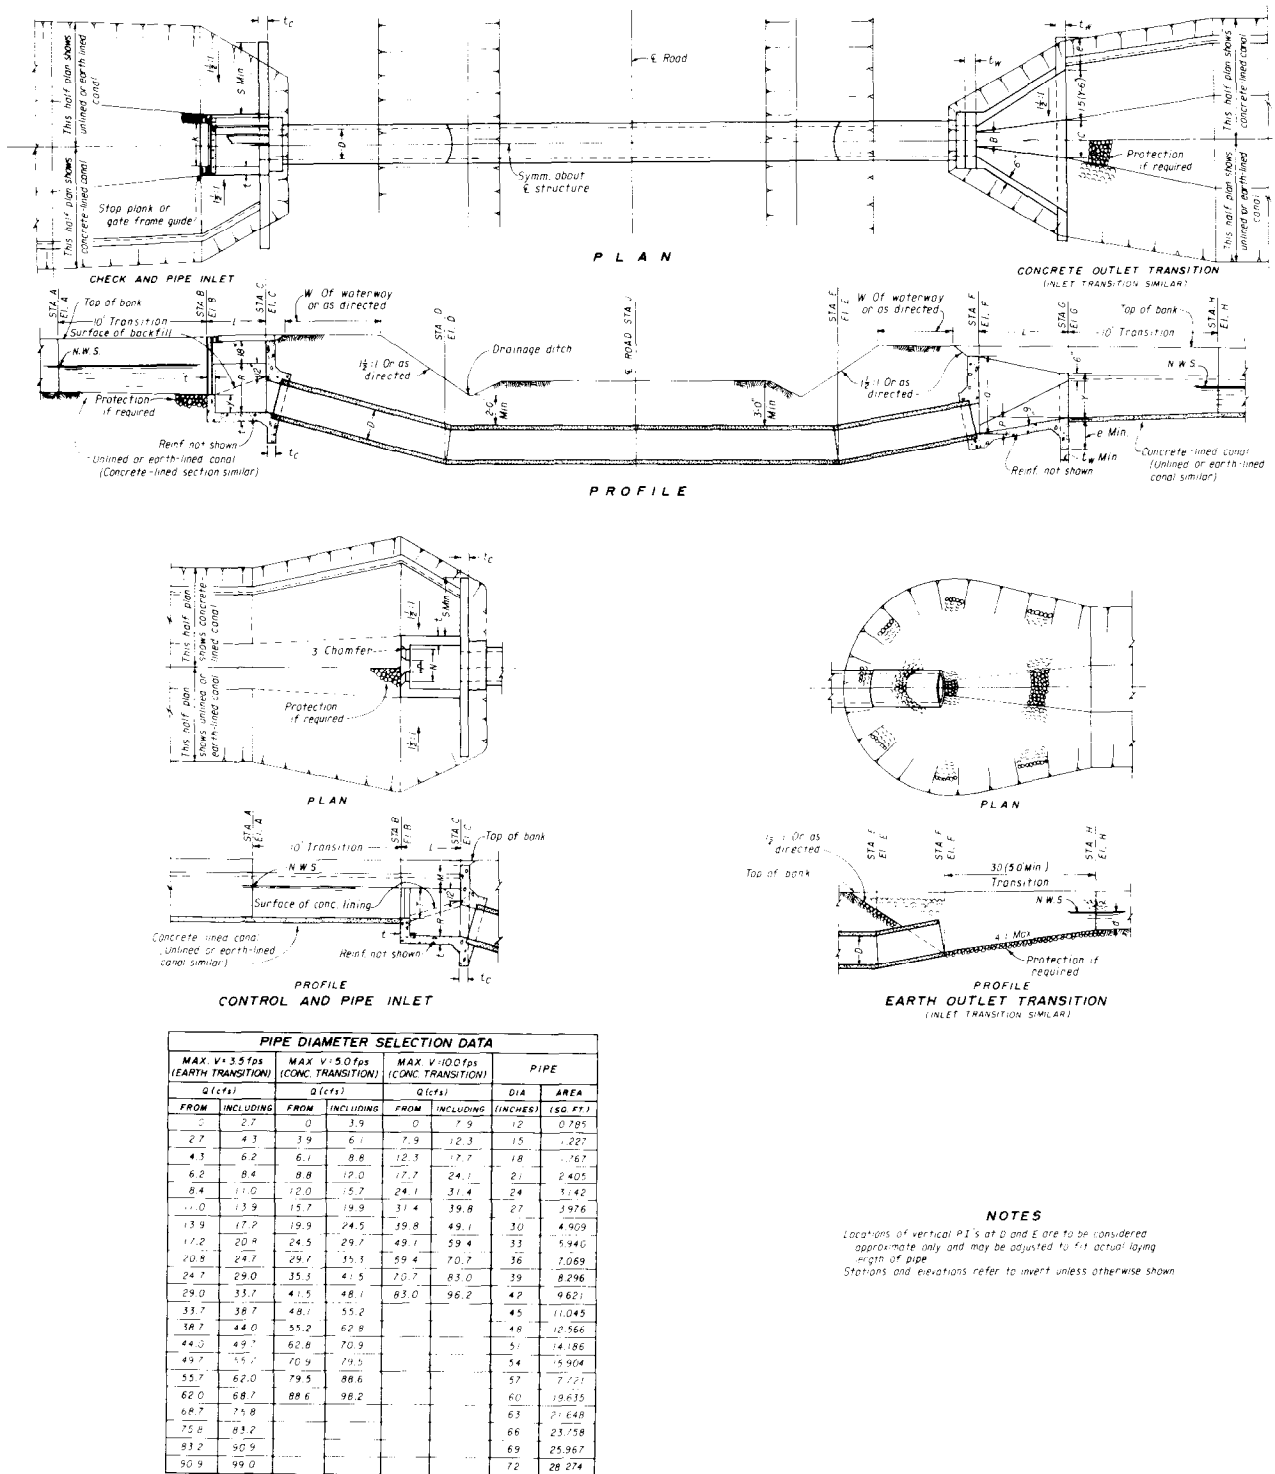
Inverted siphon plan and section. 103-D-1254.
